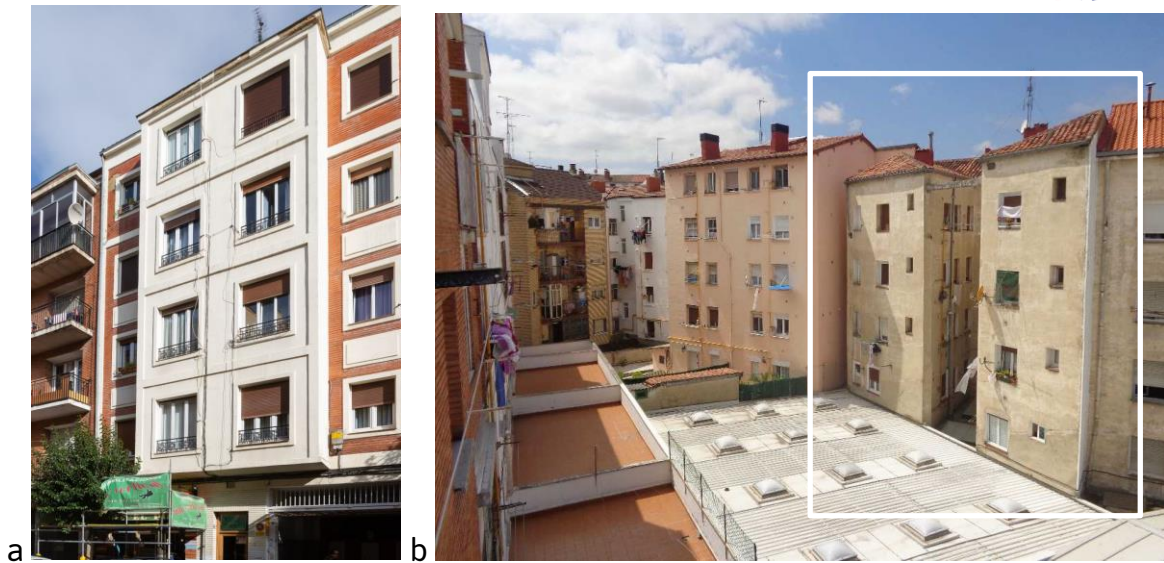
a) main and b) rear façade of the building case study. The main façade is southwest-oriented.
